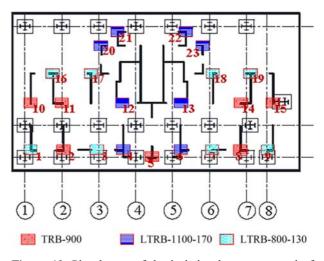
Plan layout of the isolation layer composed of thick rubber bearings.
